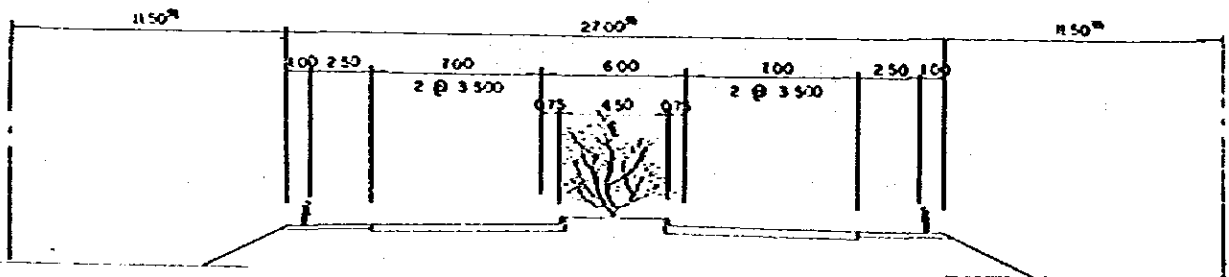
TYPICAL CROSS SECTION C-5
